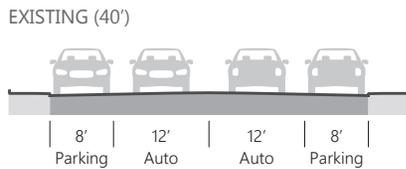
ZOE AVENUE EXISTING CROSS-SECTION
